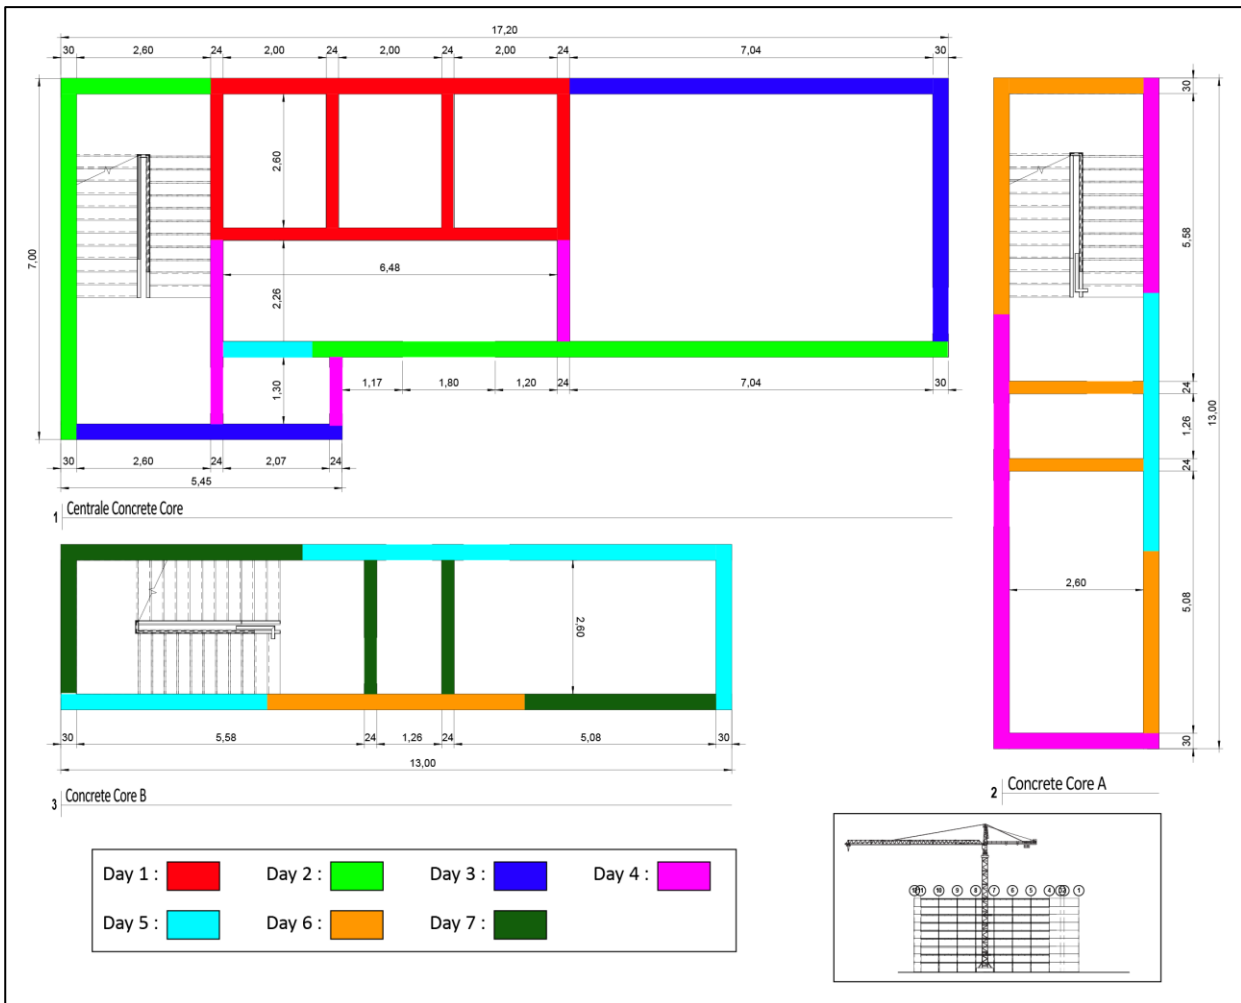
Daily rotation plan of the concrete cores building, with the use of 1 crane
